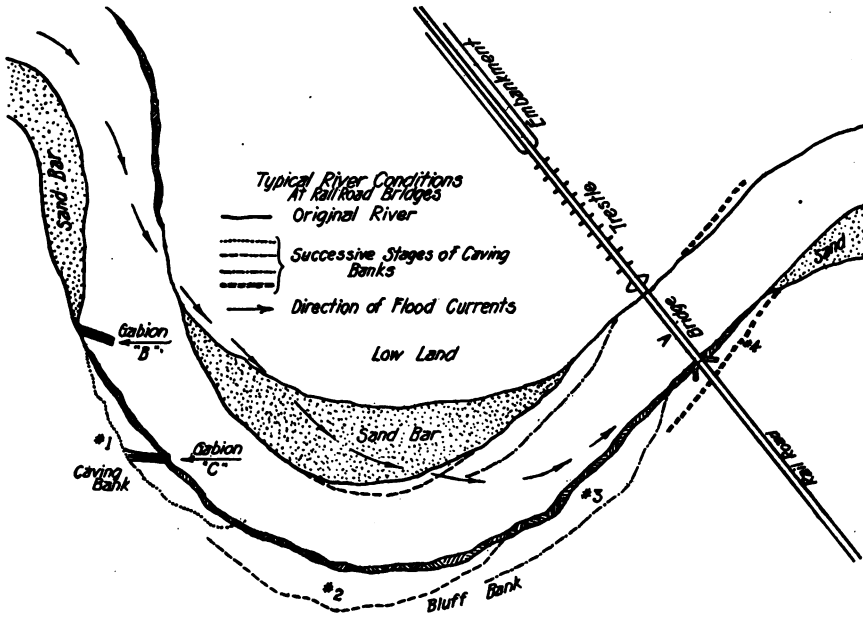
Typical River Conditions and Means of Protection of Bridge.
